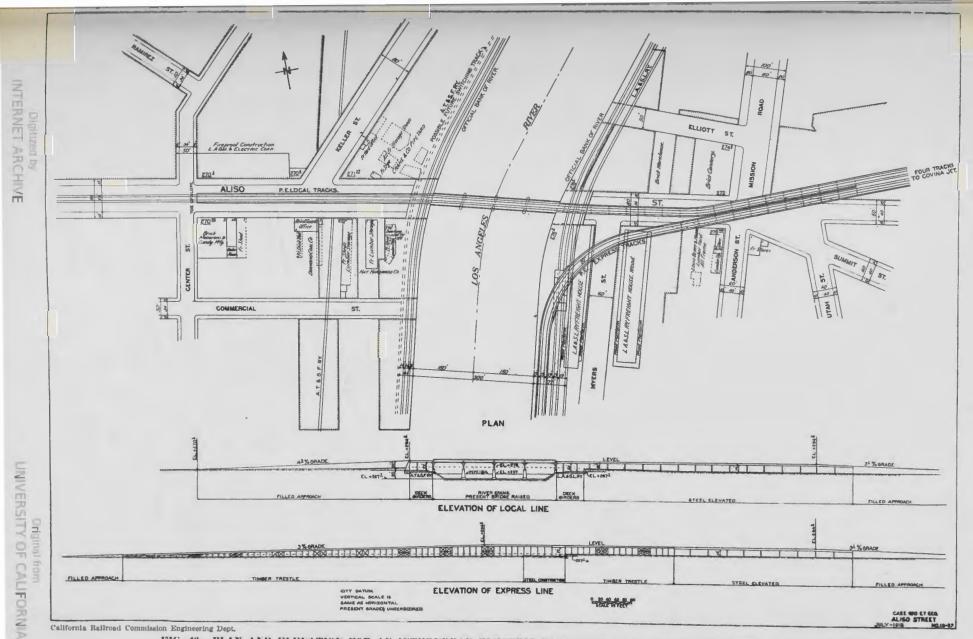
PLAN AND ELEVATION FOR AN INTERURBAN ELECTRIC RAILWAY BRIDGE ACROSS THE RIVER AT ALISO STREET
